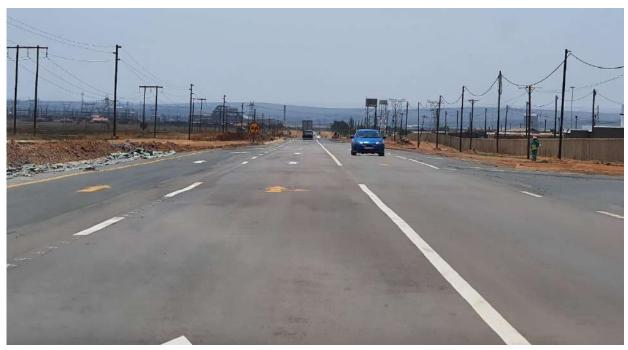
Looking north along the N11 near the new Road D intersection (Site is on the right behind the wall)
